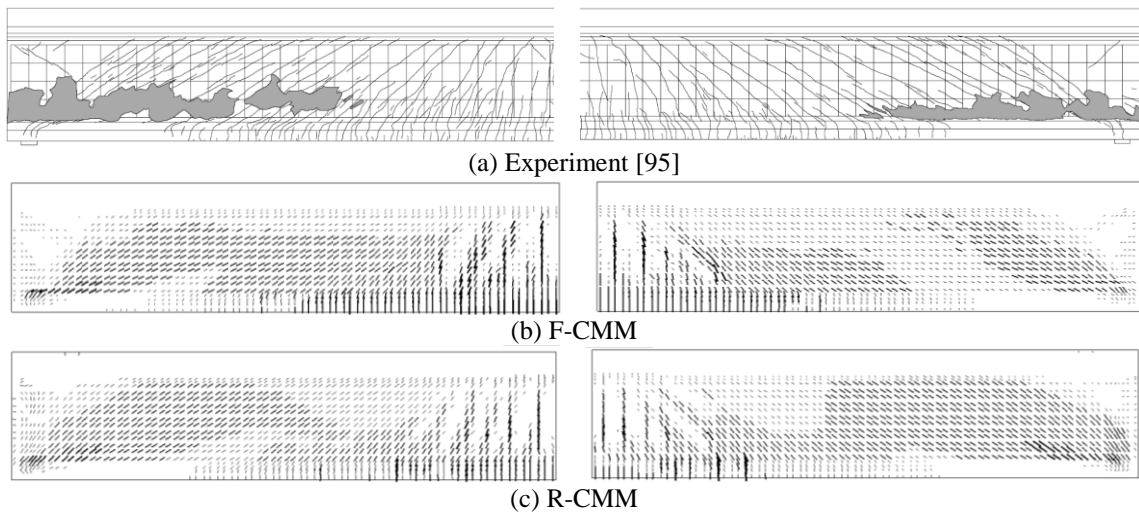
Beams G2W (left) and G2E (right): cracking patterns at failure.
